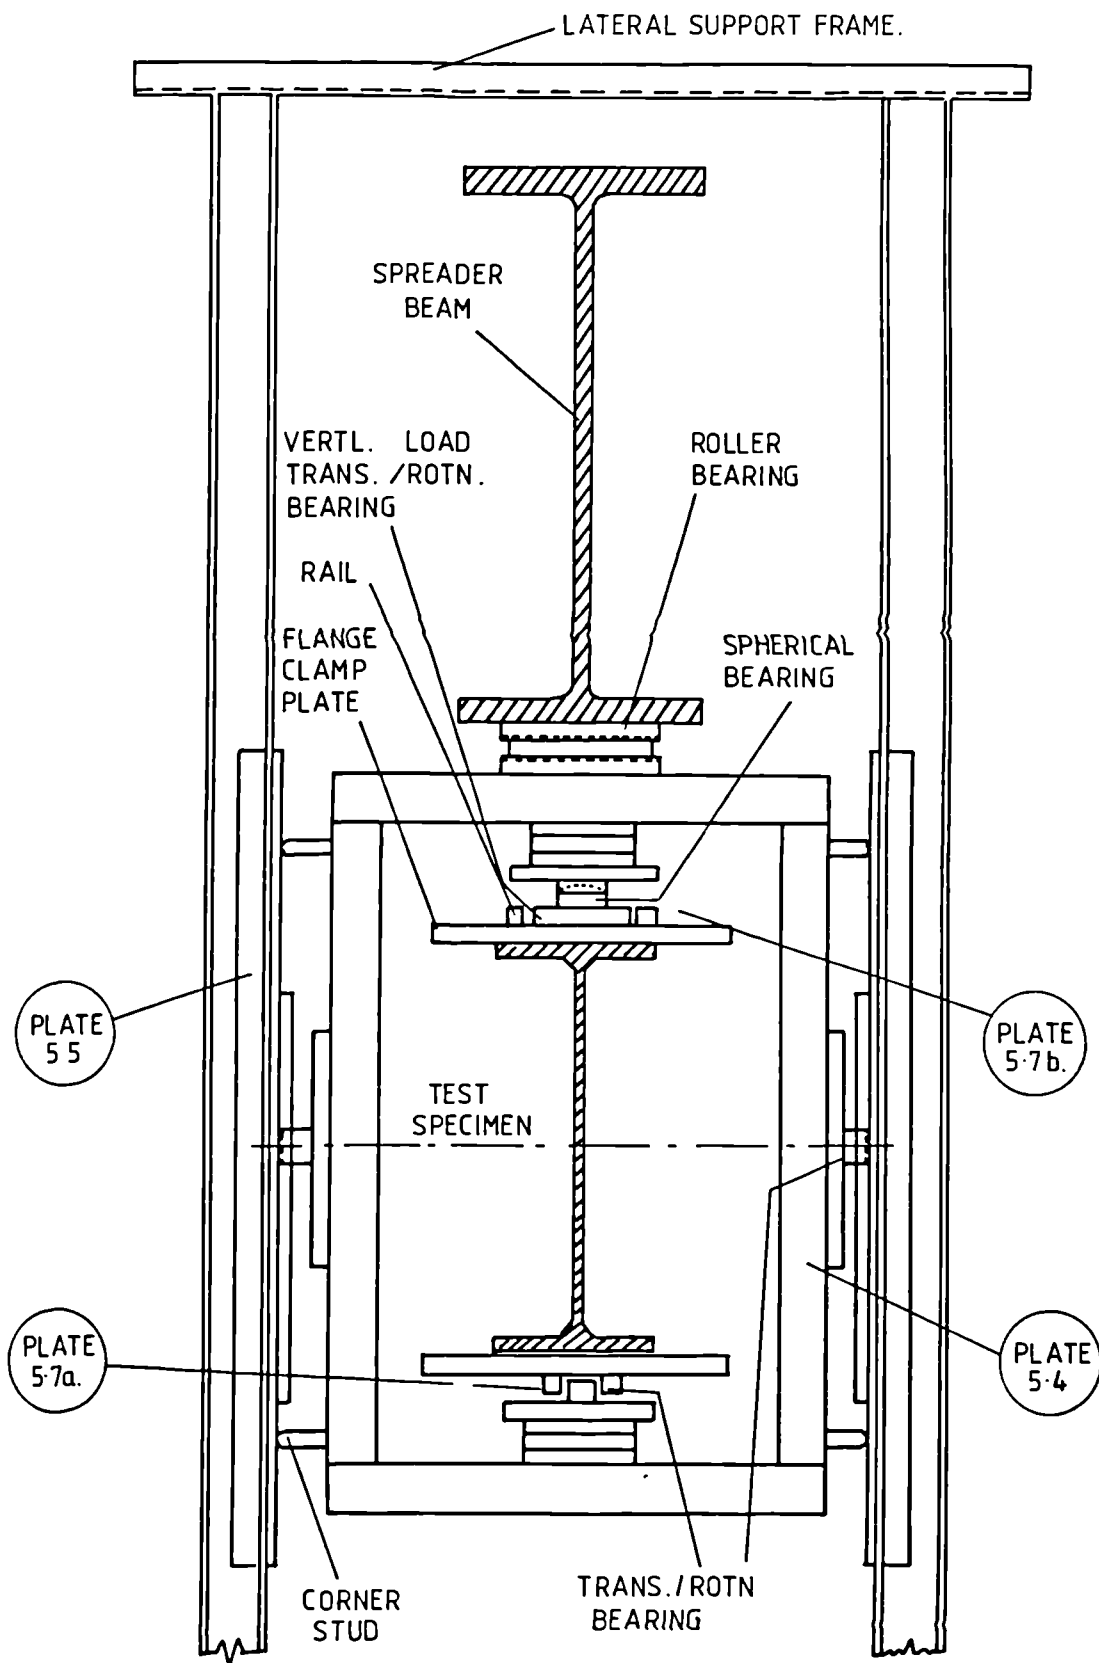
SECTION 1-1 OF FIG 5.2: DETAILS OF TEST GIRDER SUPPORT BOX FRAME AND LATERAL SUPPORT FRAME.
